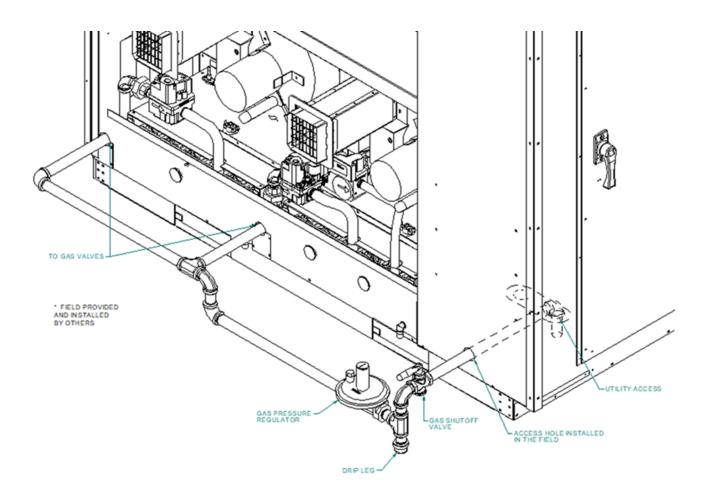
Example 6-50, 60, & 70 ton through the Base Gas Piping
